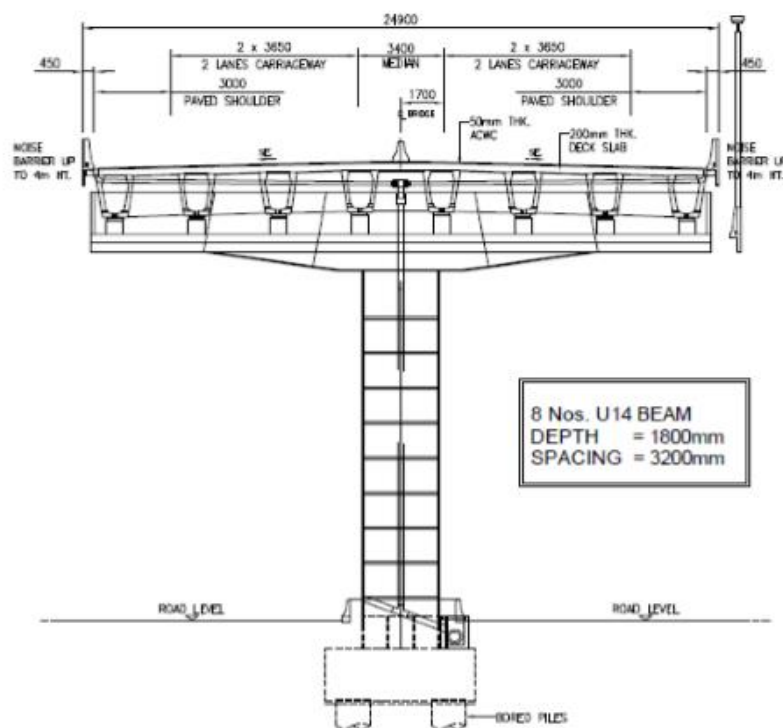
Typical cross-section of the bridge structure. Source: [23]
